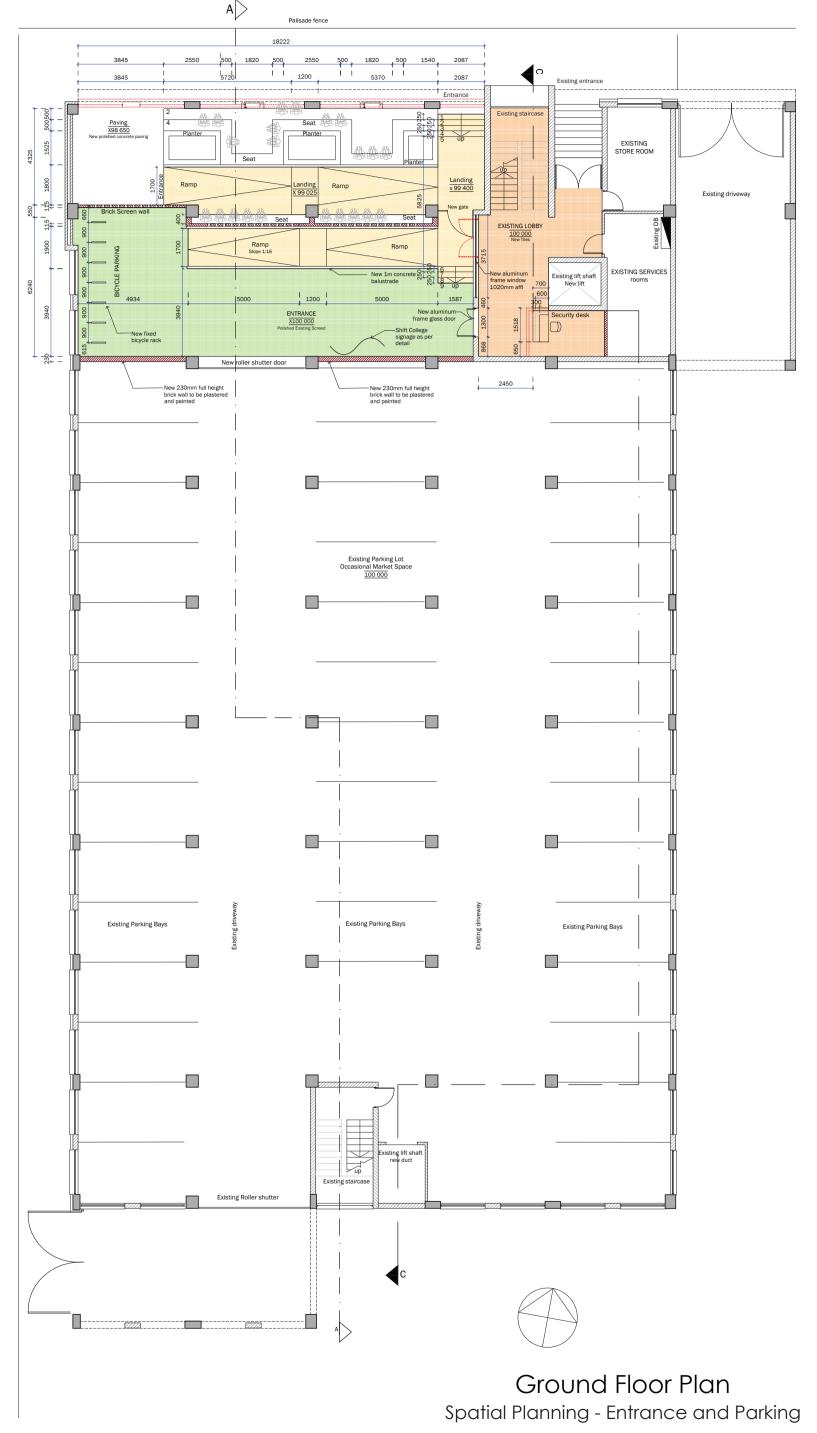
Conceptual Ground Floor Plan, June 2016
